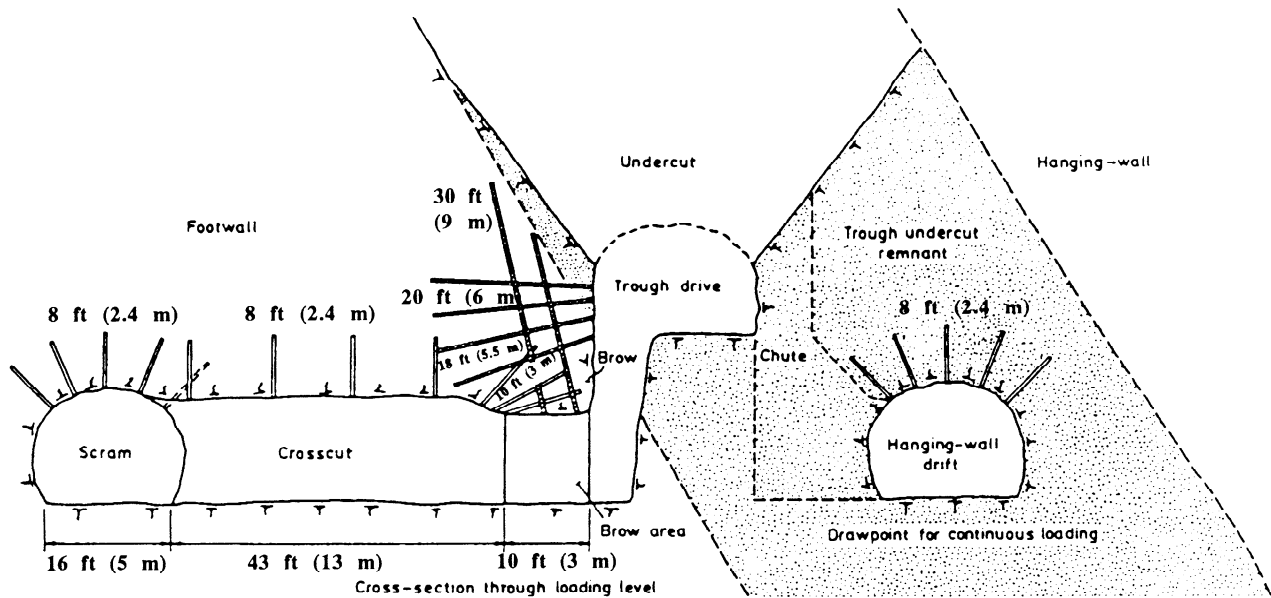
Support of loading crosscut showing brow reinforcement (Maw, 1986).
